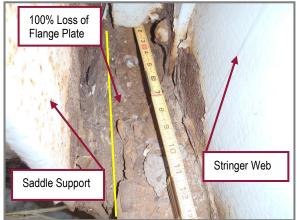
Lower deck, Stringer 3 at the saddle bearing, east face of Floorbeam 3, 100% loss of bottom flange.
